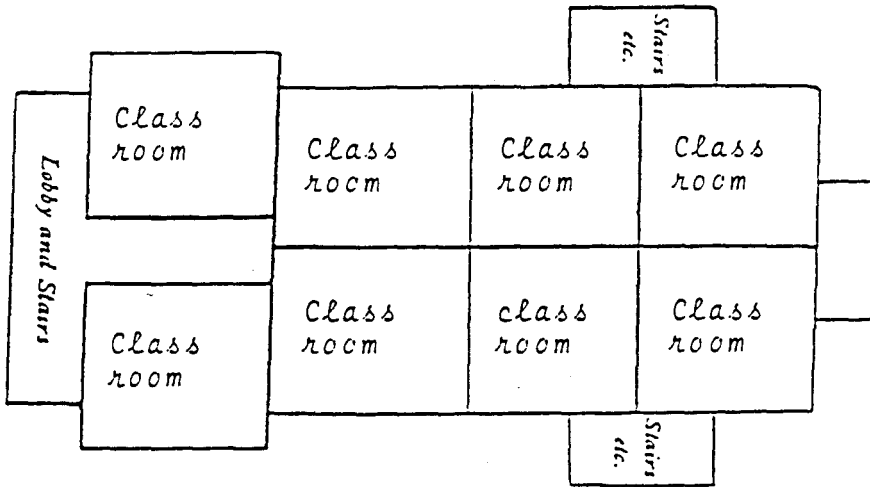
Floor plan for six or more connected classrooms. Used with permission of the Bureau of Architecture, Chicago Public Schools.
